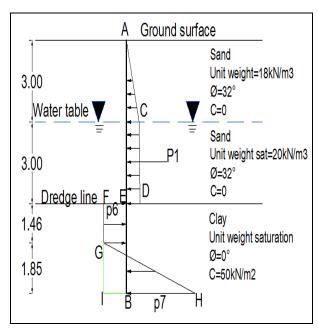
(b): Cantilever sheet pile in clay soil (case-2).
